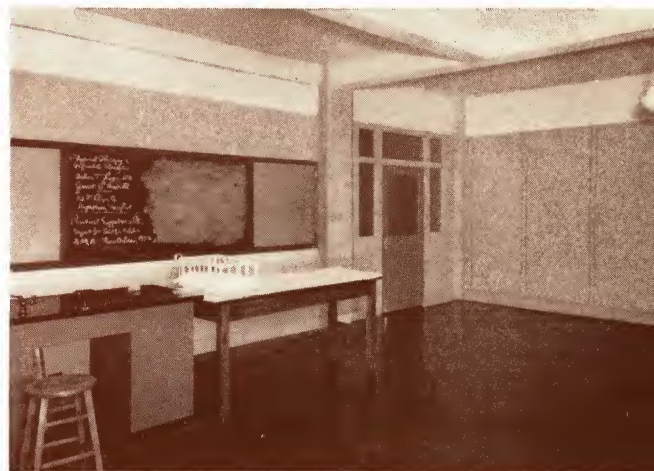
Lecture room, built of Snead Mobilwalls Type SF-3. These walls, in light tan finish, subdivide ten floors of a noted medical college.
